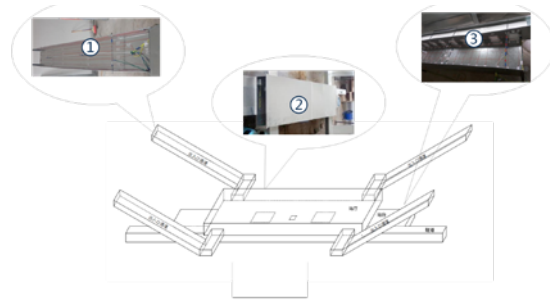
Scale model setups. 1) Corridor of entrance. 2) Hall floor. 3) Platform floor.
